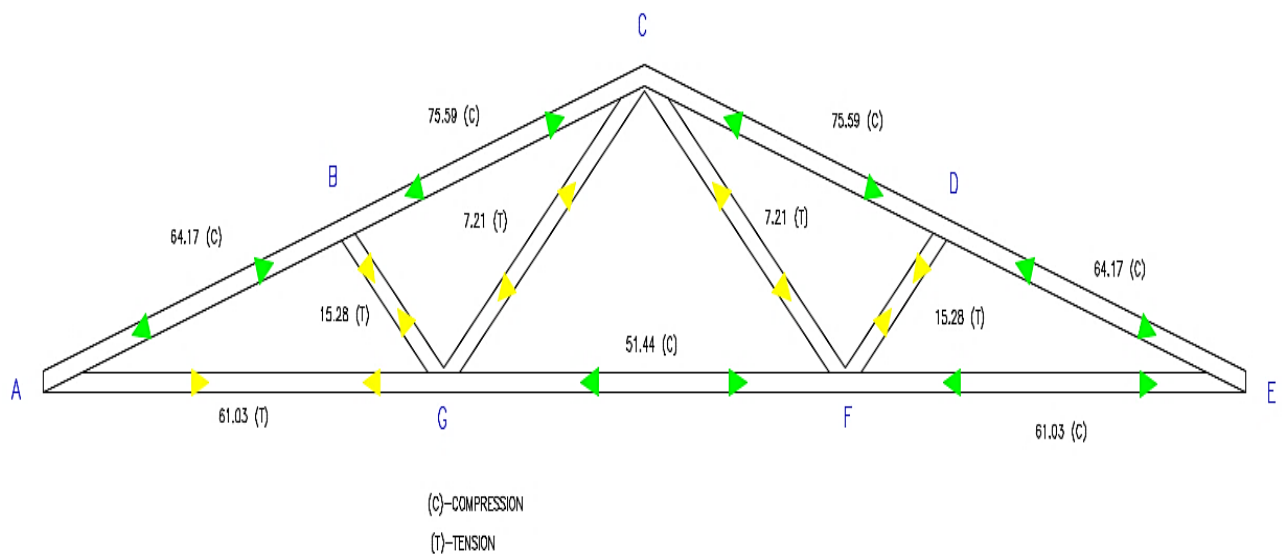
Member forces acting upon the roof truss from the $1.2DL + 1.6LL$ case.
